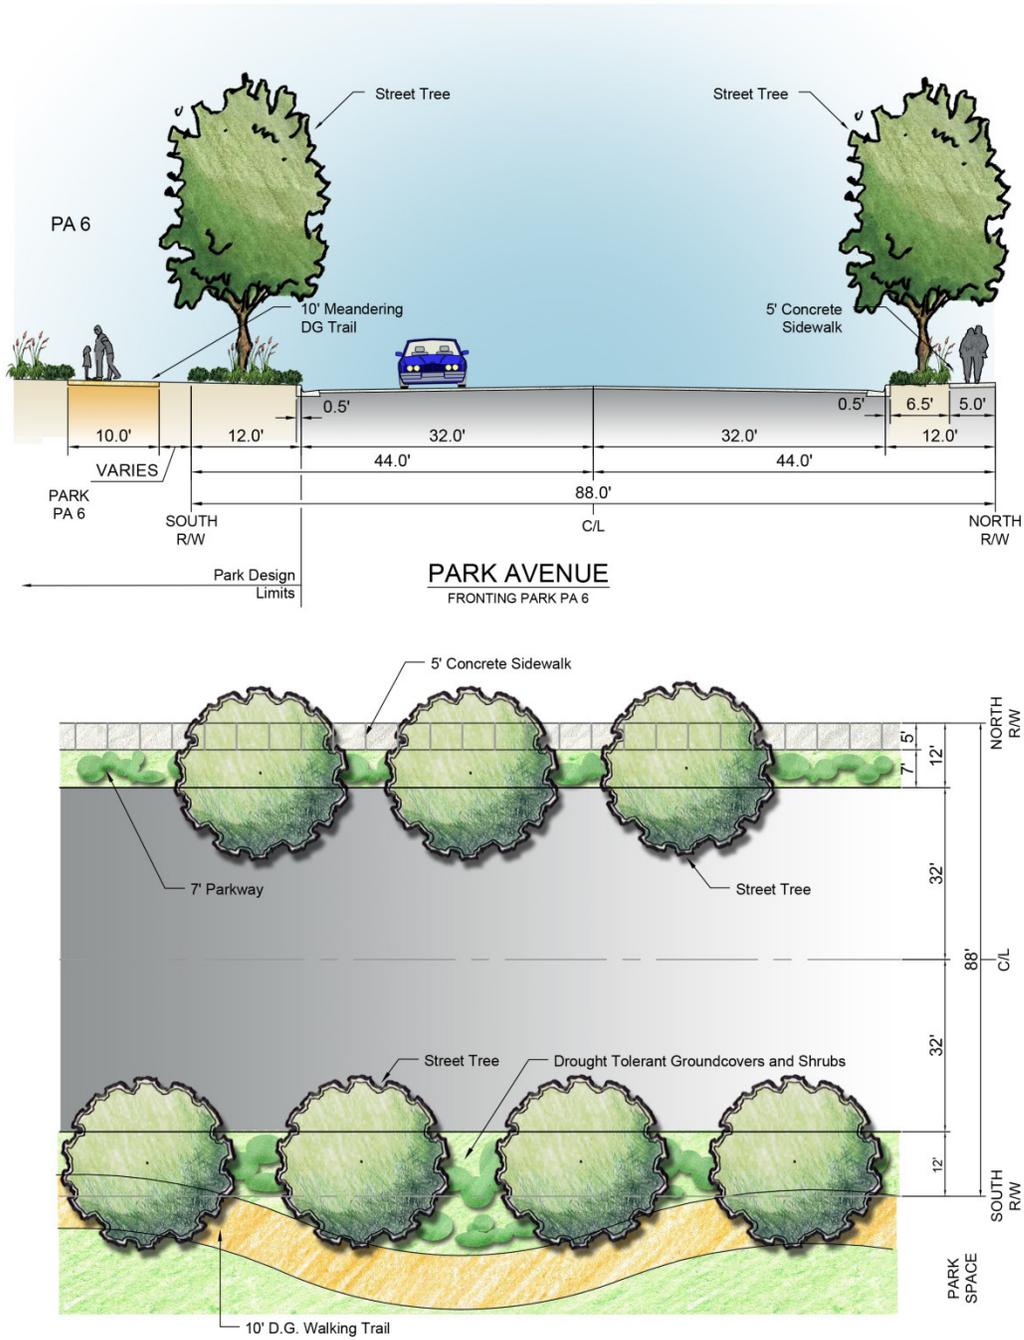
Park Avenue–Fronting Planning Area 2–7 (88’ ROW)
